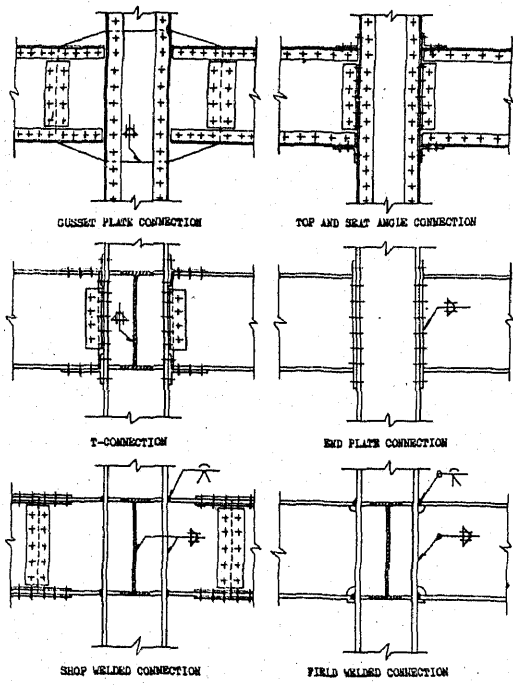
TYPICAL BEAM-TO-COLUMN CONNECTION
